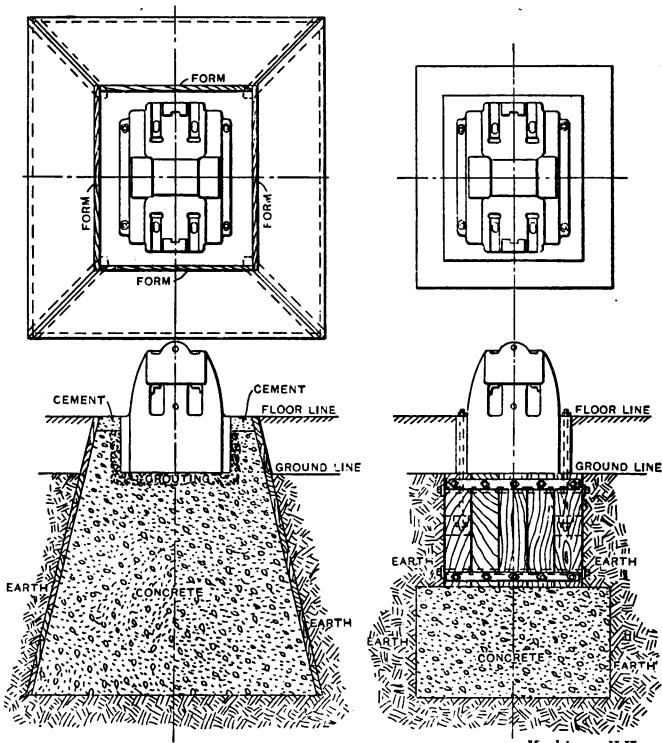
Concrete Foundations for Drop Hammers in the Pratt & Whitney Co.'s Blacksmith Shop
